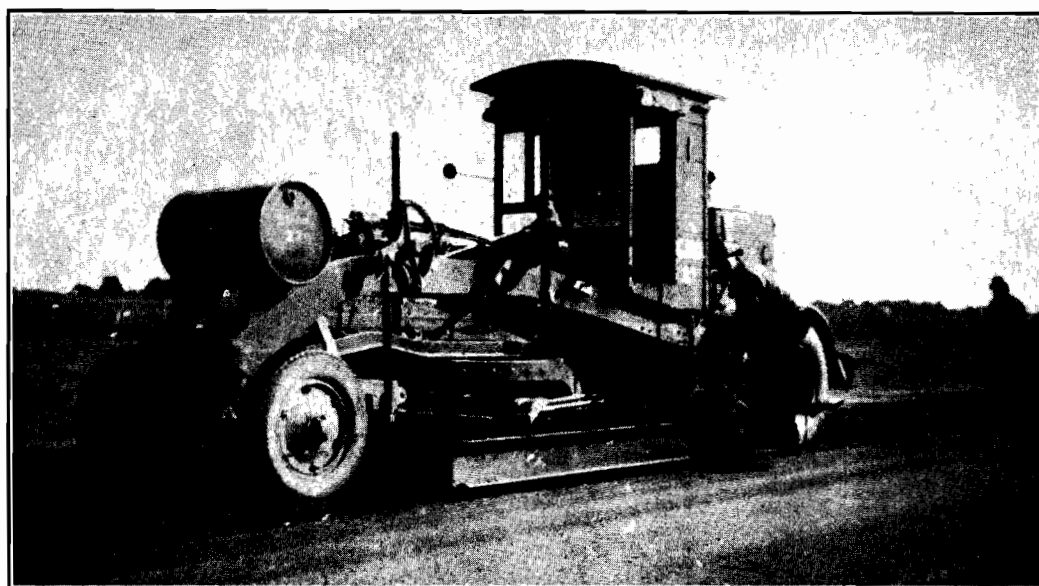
Diesel Engined Power Grader fitted with Road-Mix Seal Attachment.
